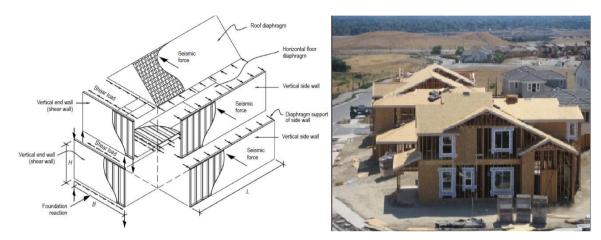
Example of timber frame construction with nailed plywood shear walls for residential buildings (NIST, 2014).
